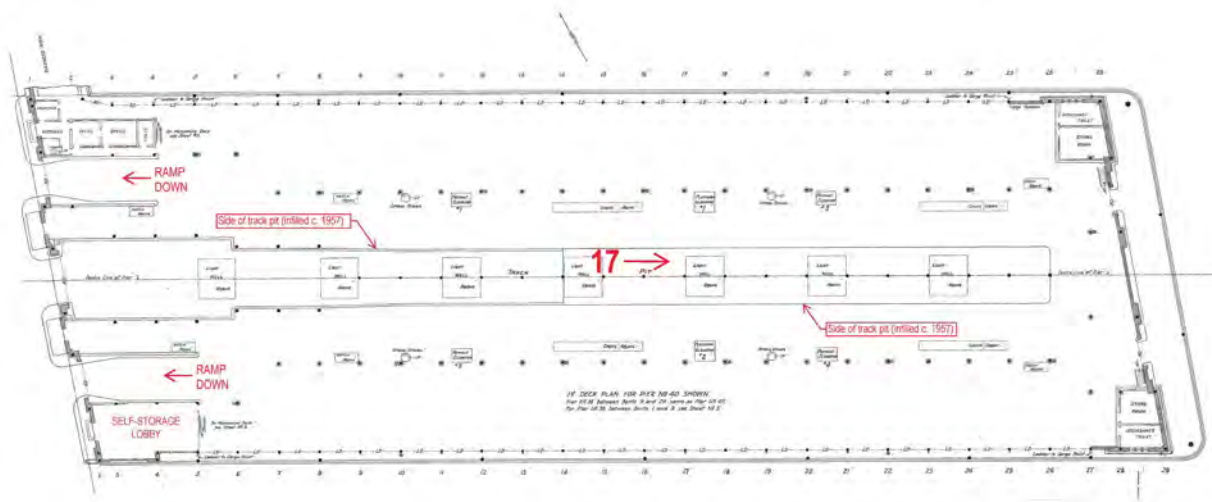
Pier 40 – Plan of first floor. This plan is taken from the original set of construction drawings and, with the exception of the missing equipment, accurately represents the existing conditions.
